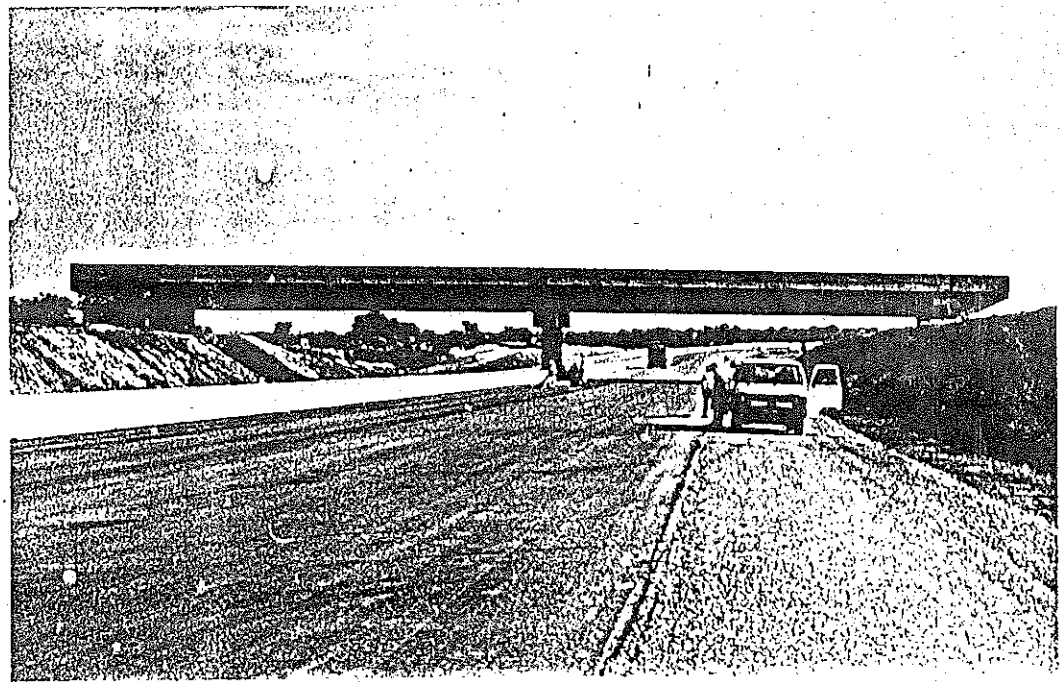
ANOTHER VIEW OF HANGING FLYOVER BRIDGE WITHOUT APPROACH ROAD
